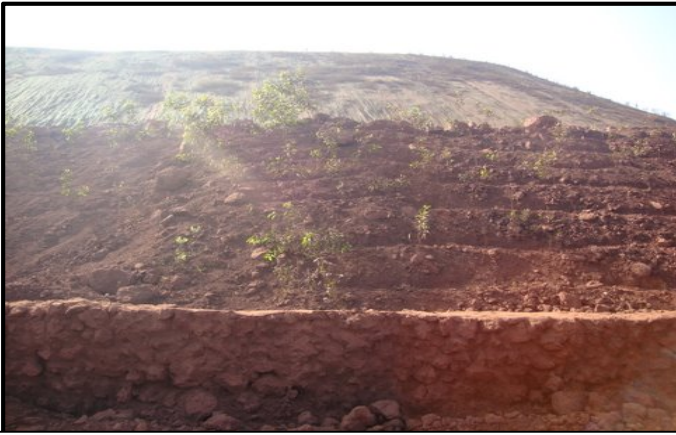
PHOTOS OF SOLID WASTE MANAGEMENT & RETAINING WALL
